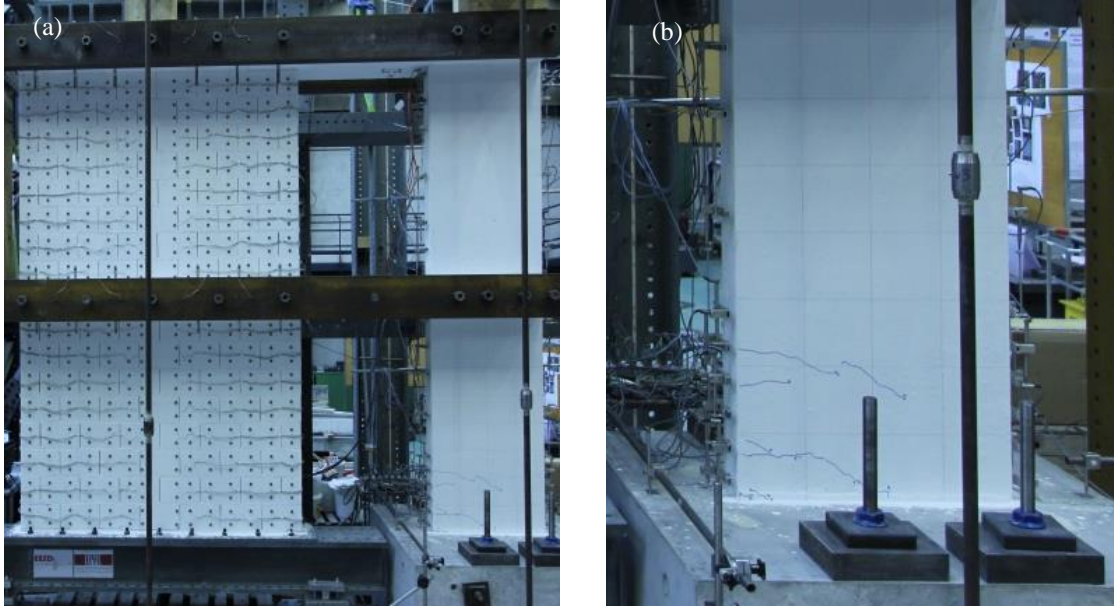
Crack pattern at LS10, $\delta = +0.1\%$. (a) specimen; (b) RC wall, first storey.
